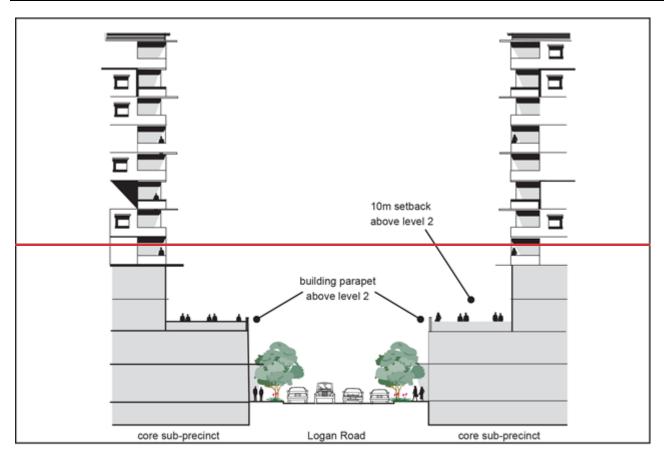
Logan Road cross section, Stones Corner precinct
